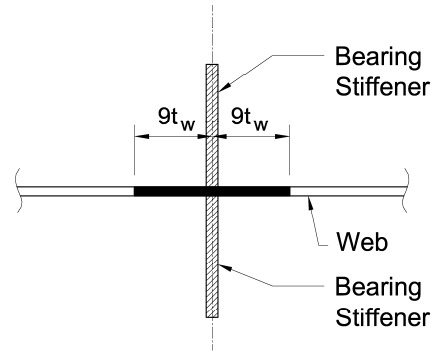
Effective Column Section for Welded Bearing Stiffener Design (One Pair of Stiffeners)
